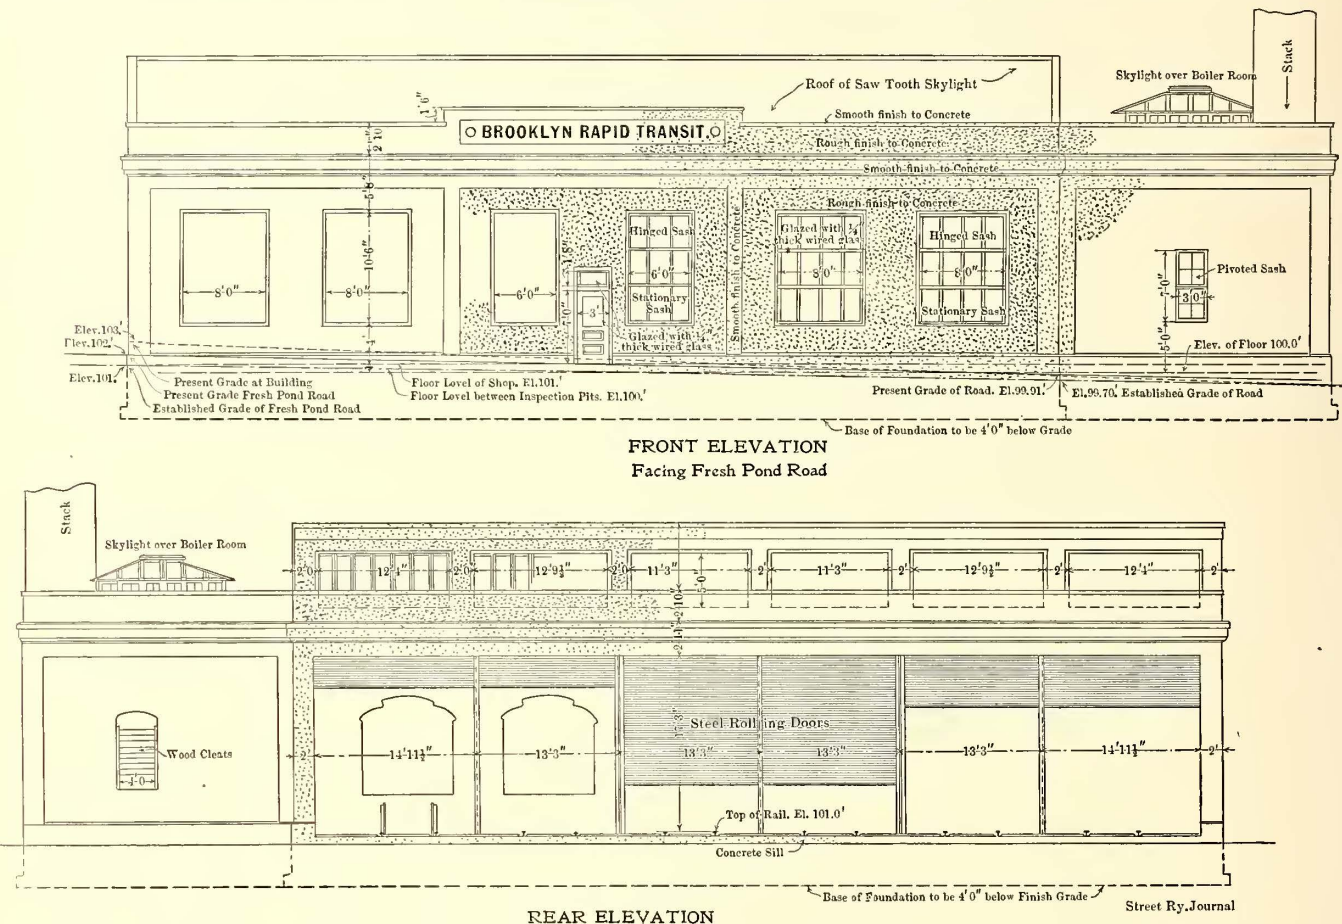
REAR AND FRONT ELEVATIONS OF THE LUTHERAN ELEVATED RAILWAY INSPECTION PLANT OF THE BROOKLYN RAPID TRANSIT COMPANY
